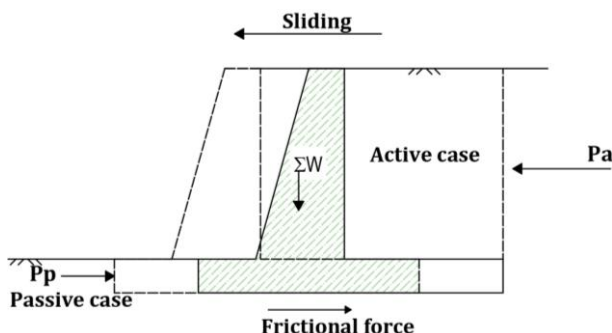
Sliding behavior in retaining wall (Uray 2020).
